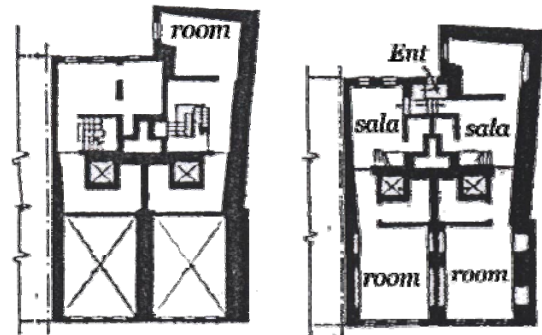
Rab' al-Tabbāna: Two floor plans of the duplex apartments
